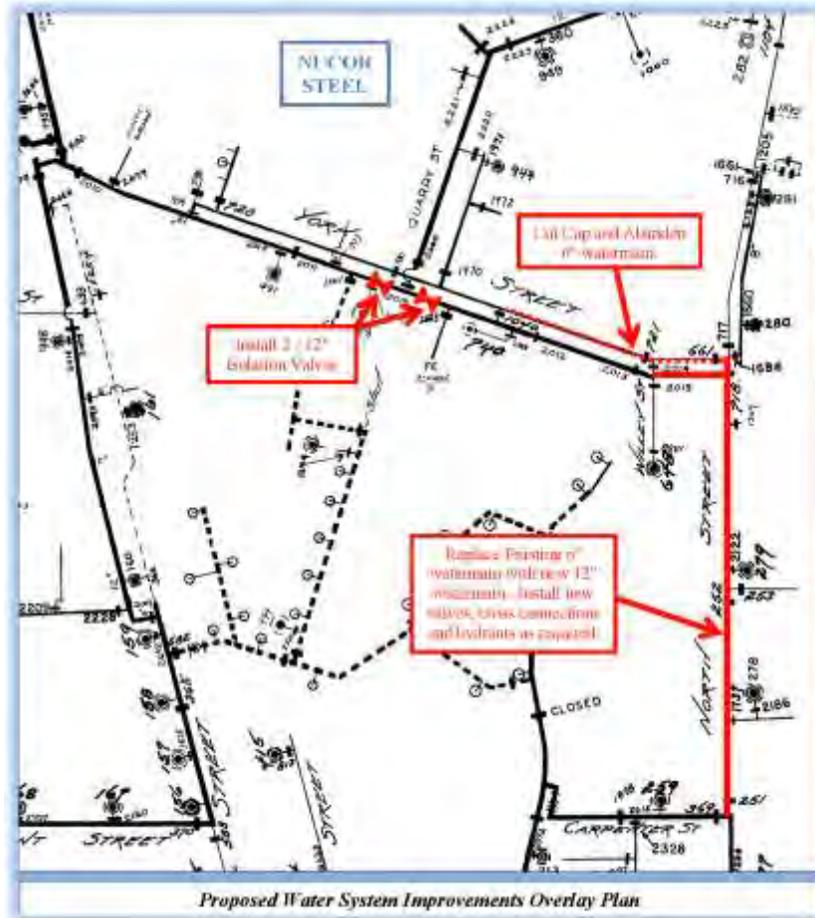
Schematic Site Plan of the project and alignment of proposed water mains, 2016.
